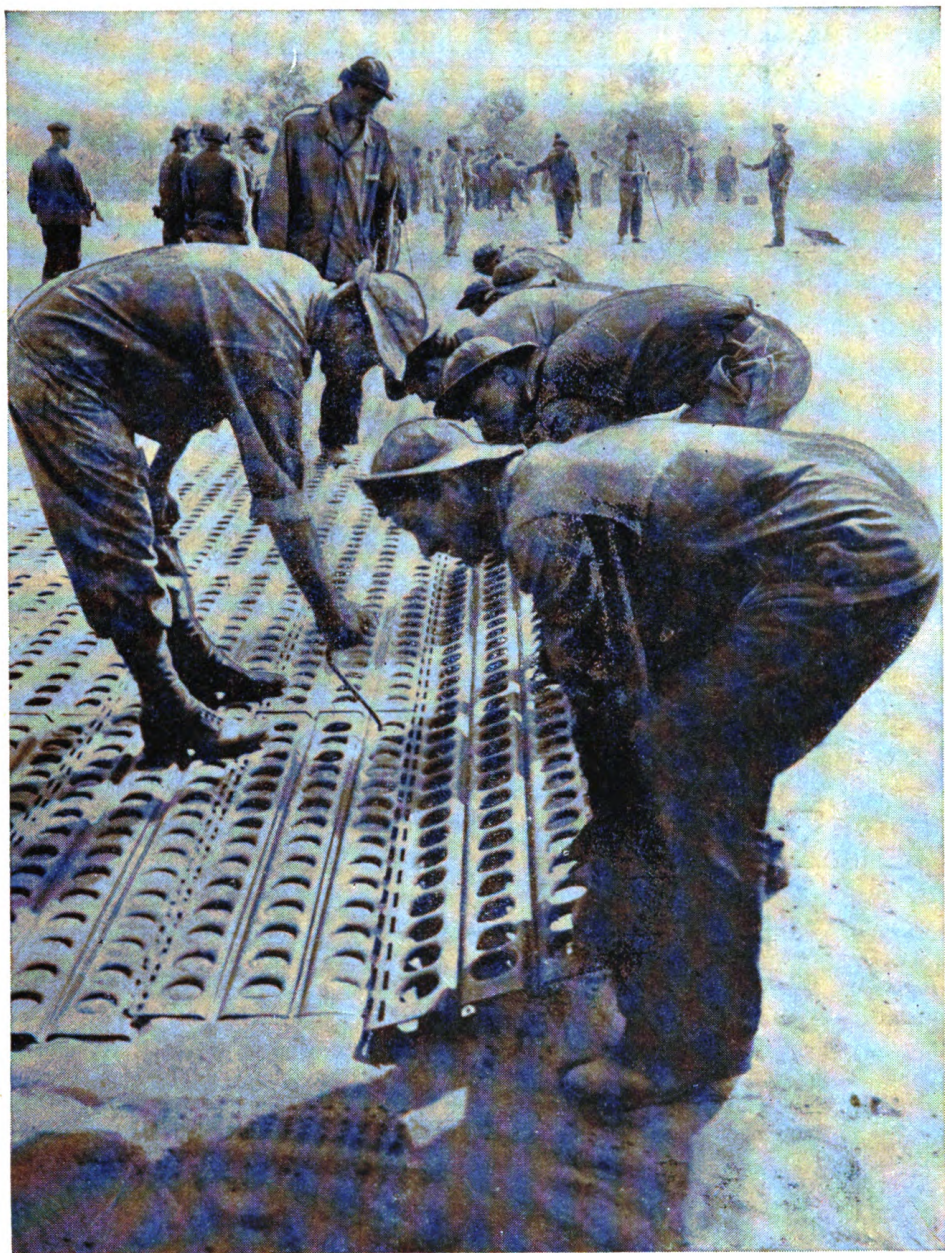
Method of laying pierced plank. Bayonet books of raised panel are inserted into slots of panel already laid. Note use of short planks at ends of alternate rows to obtain staggered joints.
